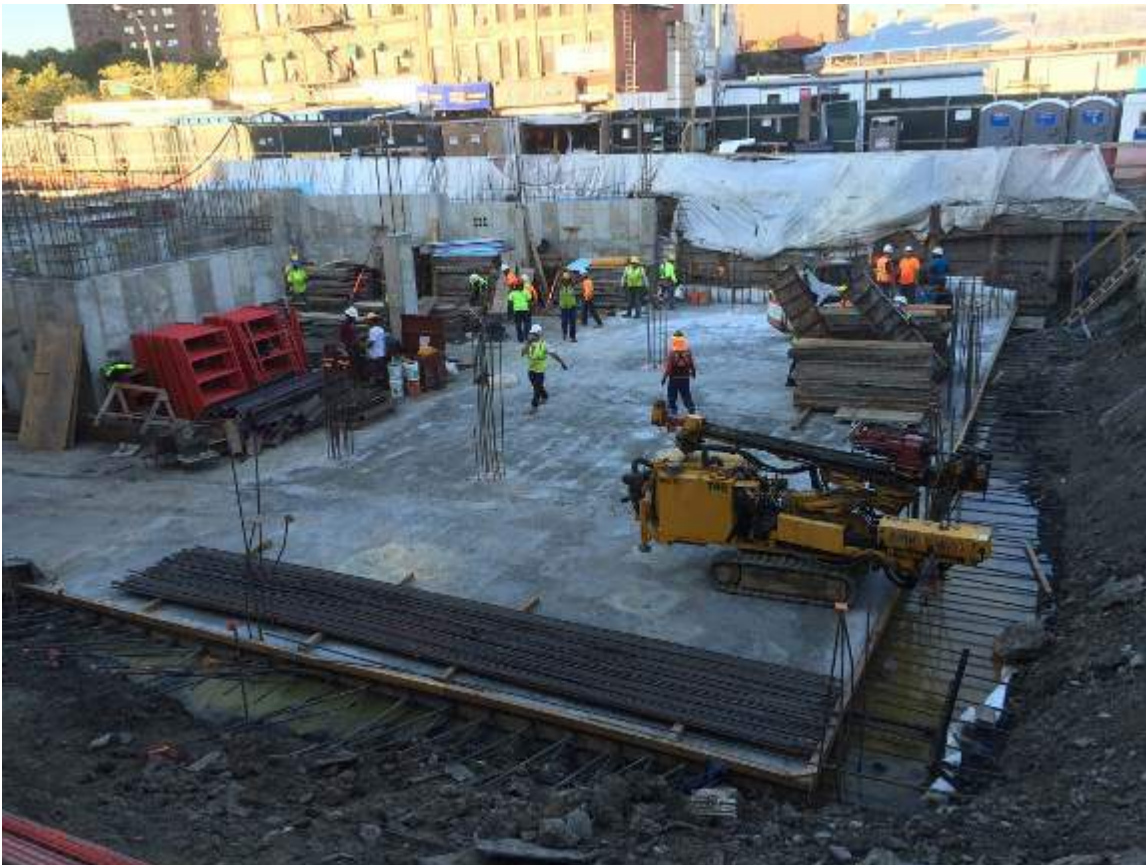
View of the contractor installing the waterproofing membrane along the exterior portion of the southern boundary of the Site.
